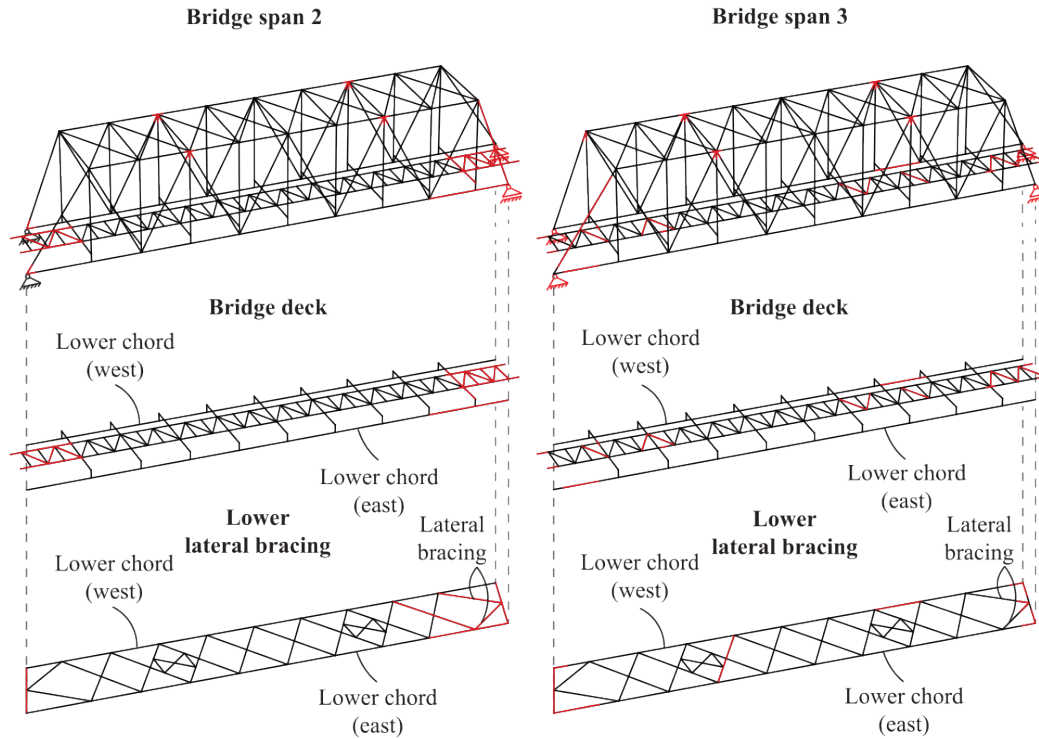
Damage overview and bridge condition after the bridge collapse. Damaged areas of beam members and joints are highlighted in red
